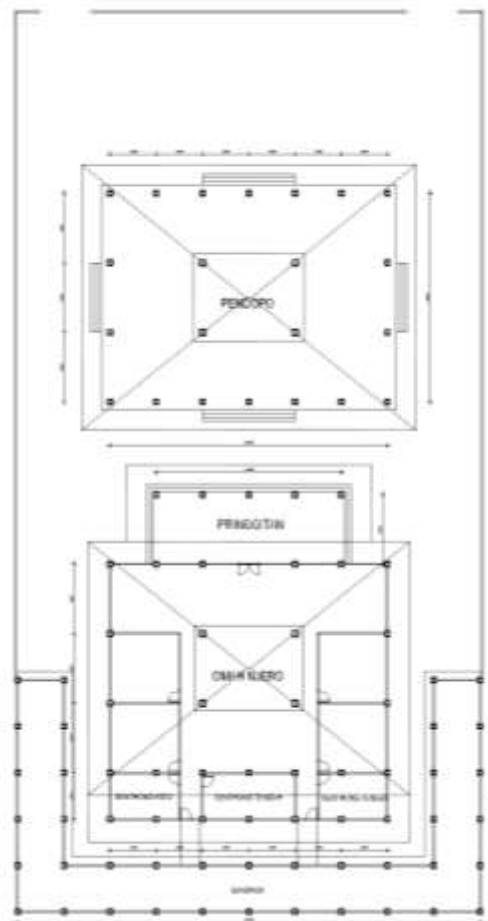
Floor Plan of a Joglo House of the Aristocracy
